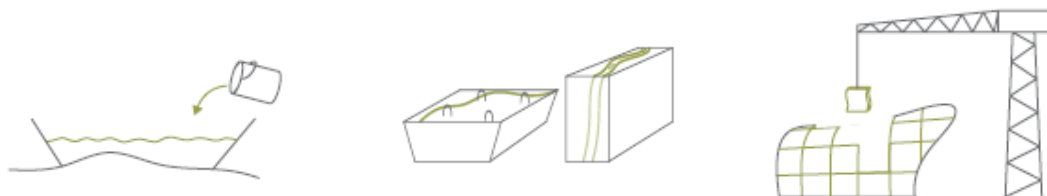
Pouring filling, single or double sided moulds and of mounting elements
